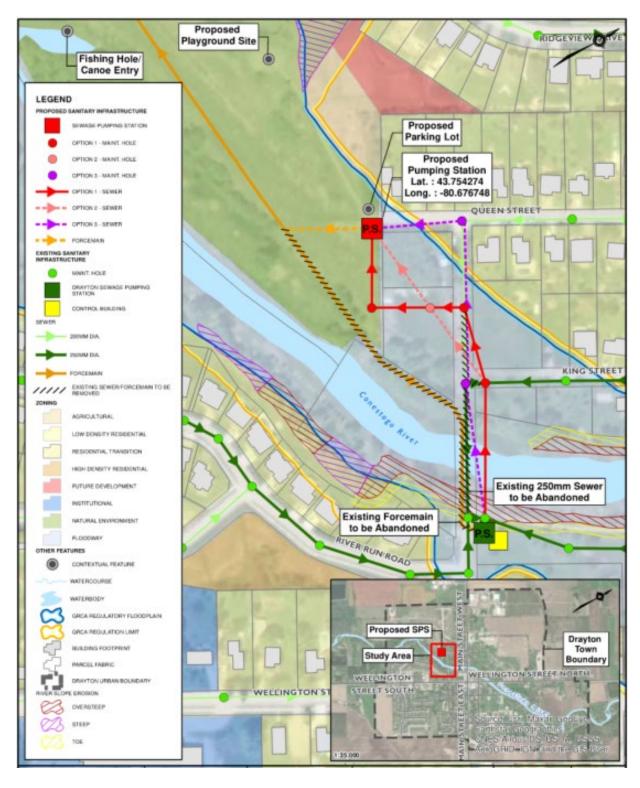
Location of the new Drayton SPS alternative on North side of the Conestoga River
